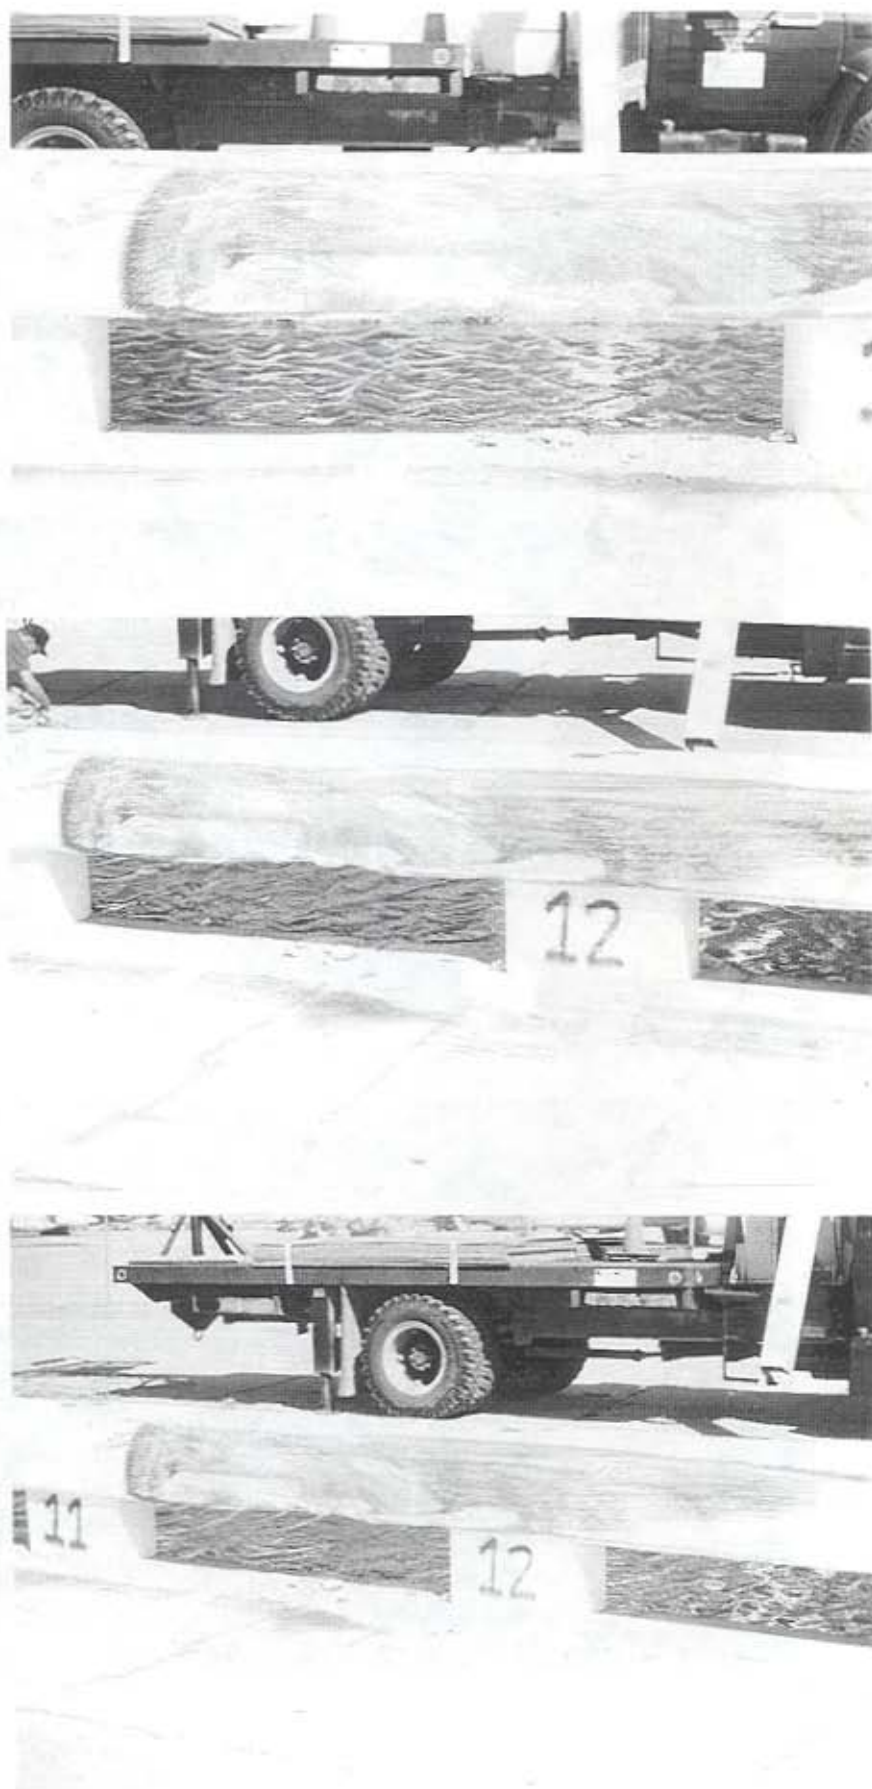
Bridge Rail Damage, Test NEOCR-5
